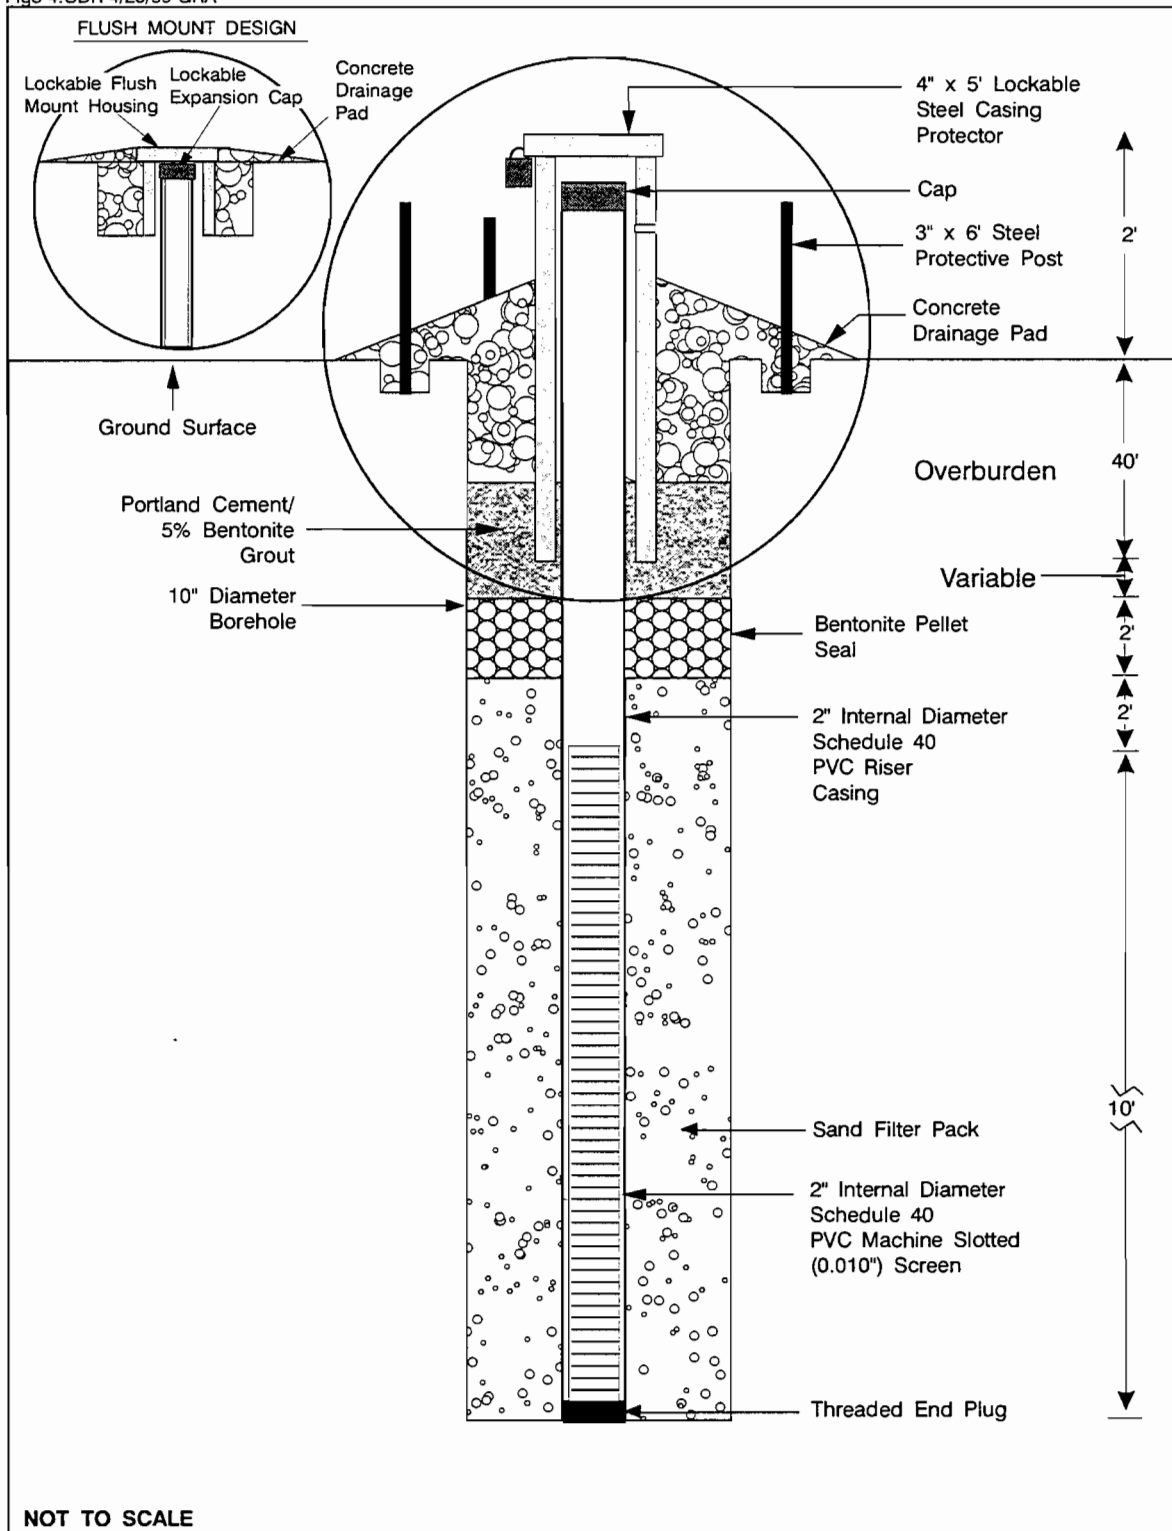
PROPOSED CONSTRUCTION FOR TELESCOPING OVERBURDEN GROUNDWATER MONITORING WELL
